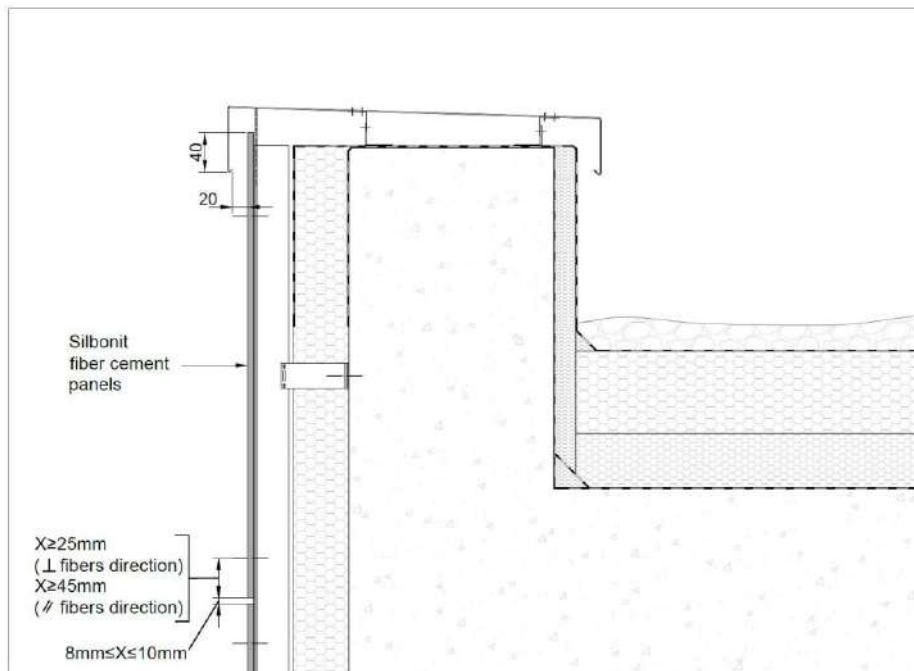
Example of a vertical section of the coping of the ventilated facade cladding. Aluminum subframe.
